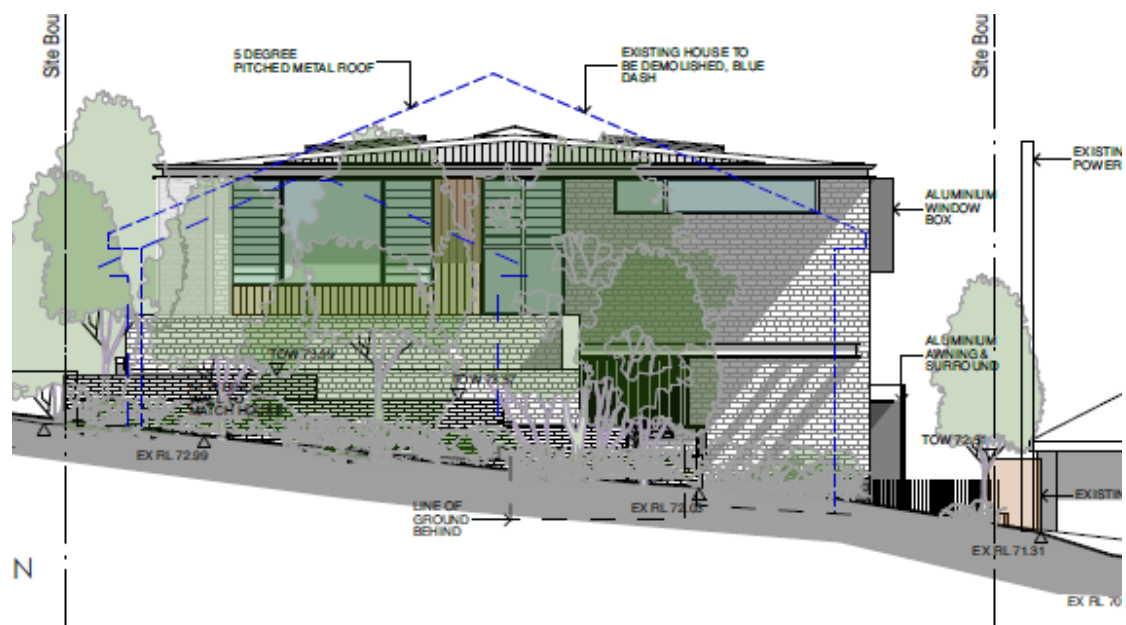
Plan extract of southern elevation showing proposed single storey carparking structure located some 2.26 metre lower, and 500mm setback further into the site, than the existing carparking structure at the front of the subject property as outlined in blue.
